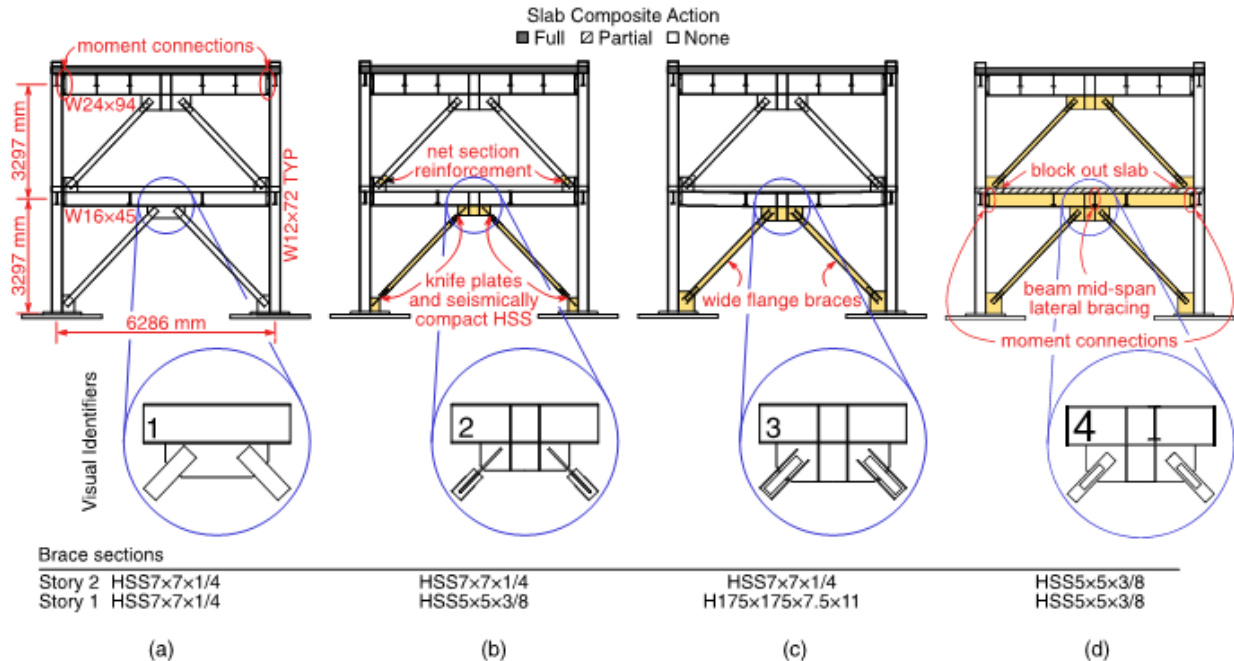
Specimen elevations and visual identifiers: (a) Specimen1; typical sections and geometry; (b) Specimen 2; (c) Specimen 3; (d) Specimen 4 (Sen et al. 2016)
